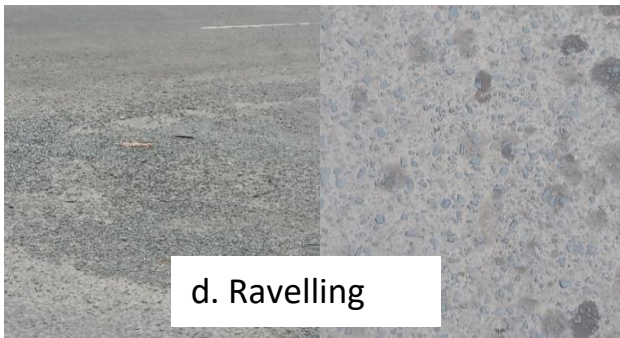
ravelling: Defects on RTI along the Olembe-Nkometou 1, stretch of road.
